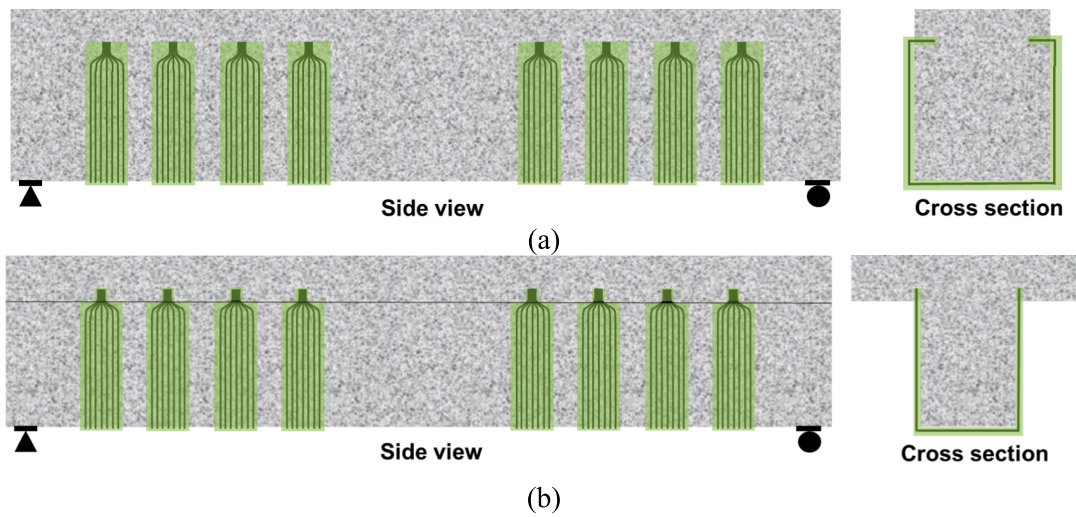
Design of the novel anchorage system for shear strengthening of an RC beam: (a) rectangular cross section, and (b) T-shaped cross section.
